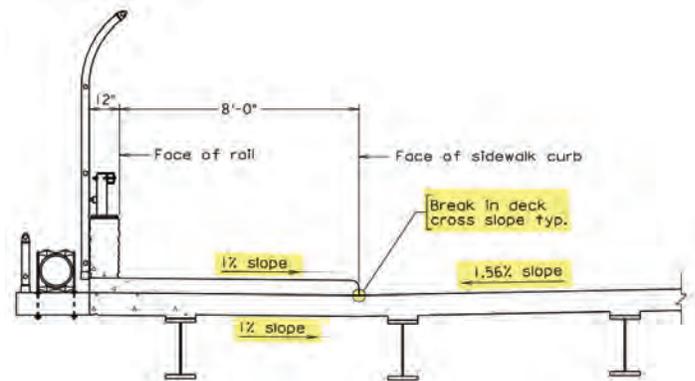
Bridge Cross Slope Modification at 1st, 4th, and 7th Street Bridges
